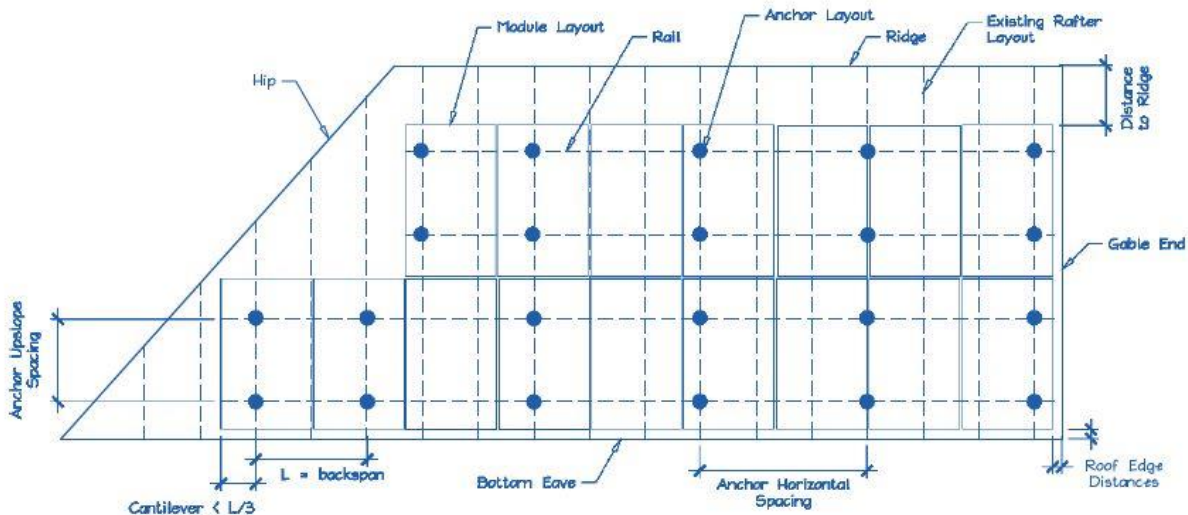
Sample Solar Panel Array and Anchor Layout Diagram (Roof Plan).
